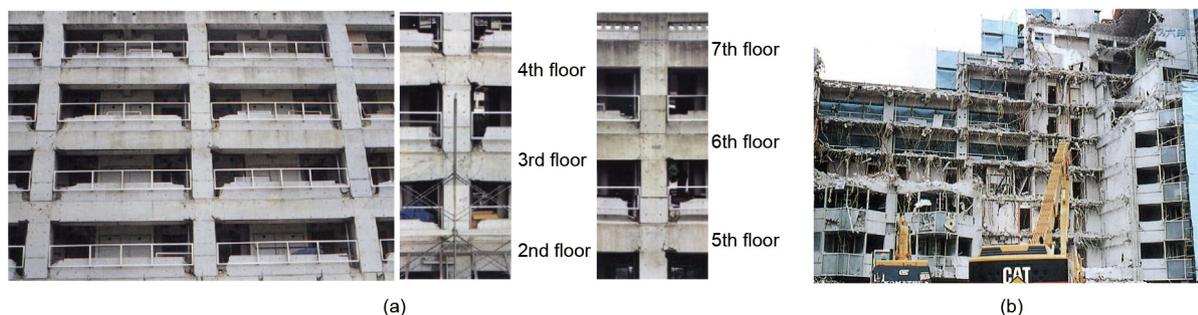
Damaged and demolished residential buildings in the Great Hanshin Earthquake. (a) Flexural cracks of beams; (b) demolished building.
